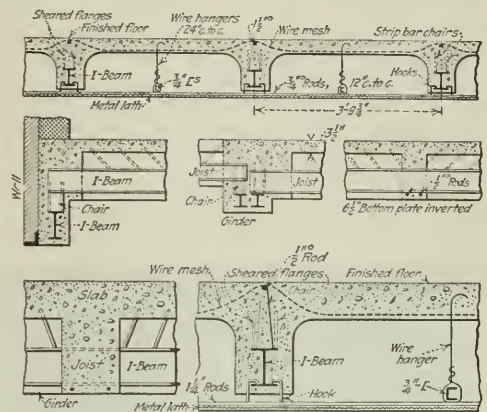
FLOOR CONSTRUCTION OF SIR WALTER HOTEL
